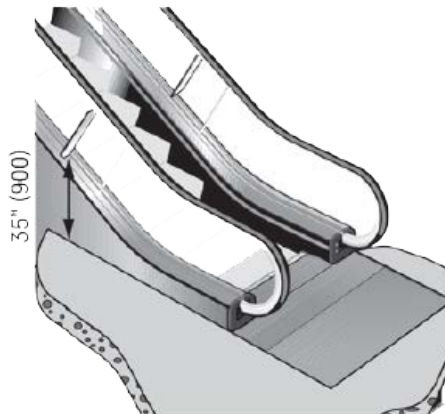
Additional deck barricade (Source: ThyssenKrupp Elevator Americas, n.d.)
